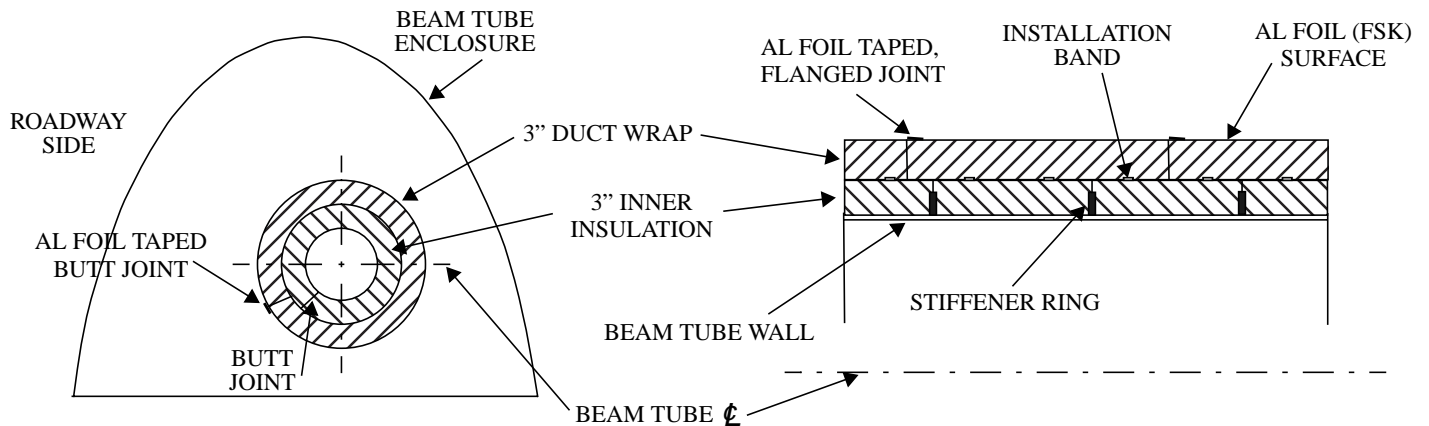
Beam tube wall insulation - schematic (not to scale) section views
